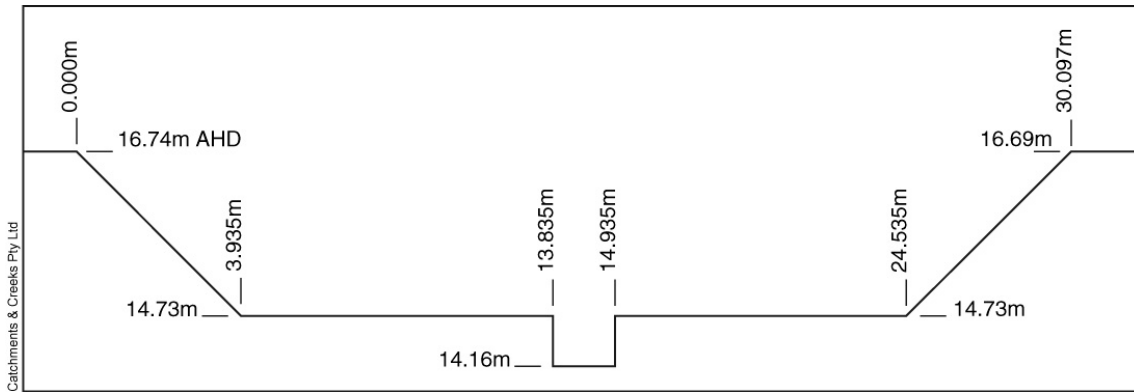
Cross section (xs573) of chute crest, Gay Street drop structure
